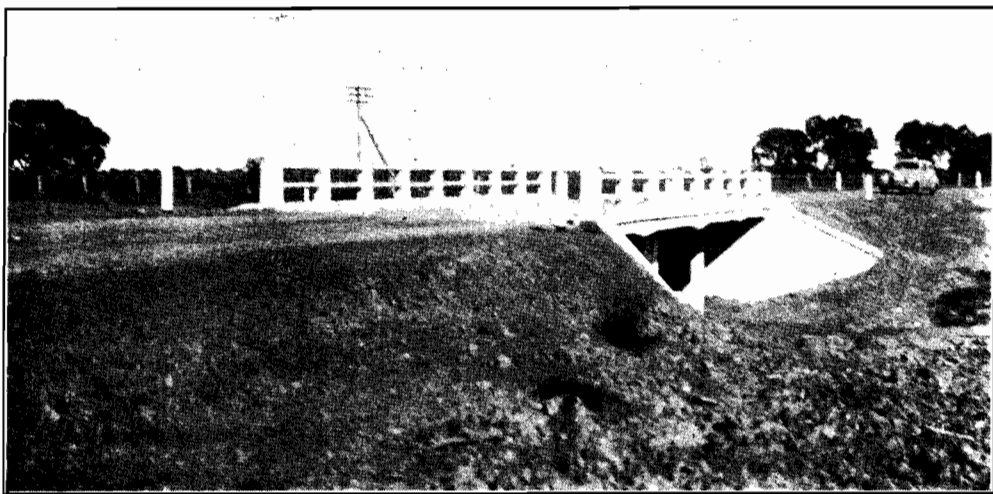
Showing new concrete bridge erected on the Koroop Road to replace old structure shown above.
